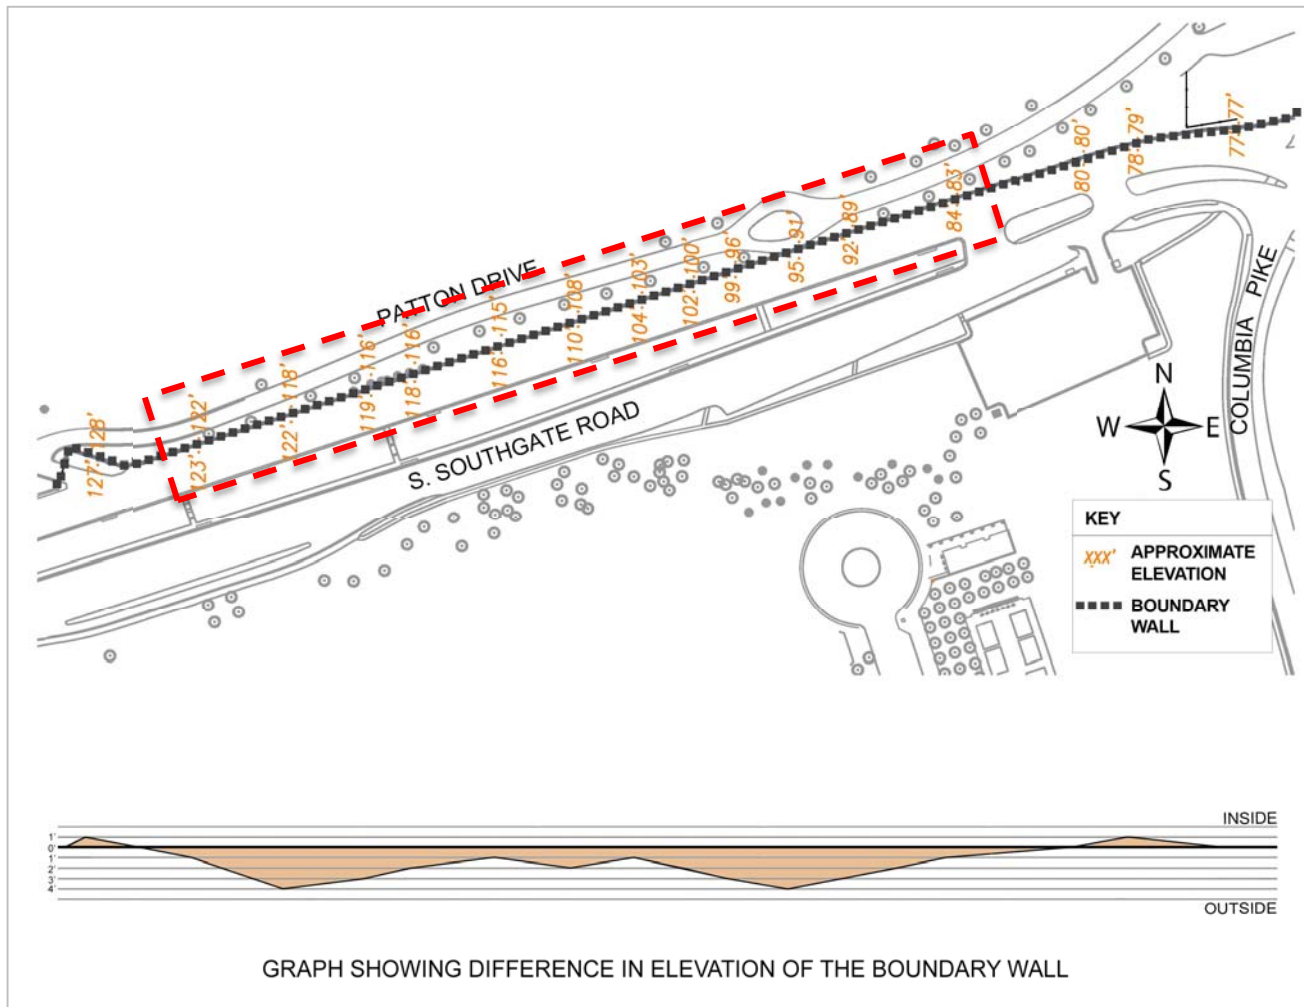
Area of boundary wall acting as a retaining wall with spot elevations
